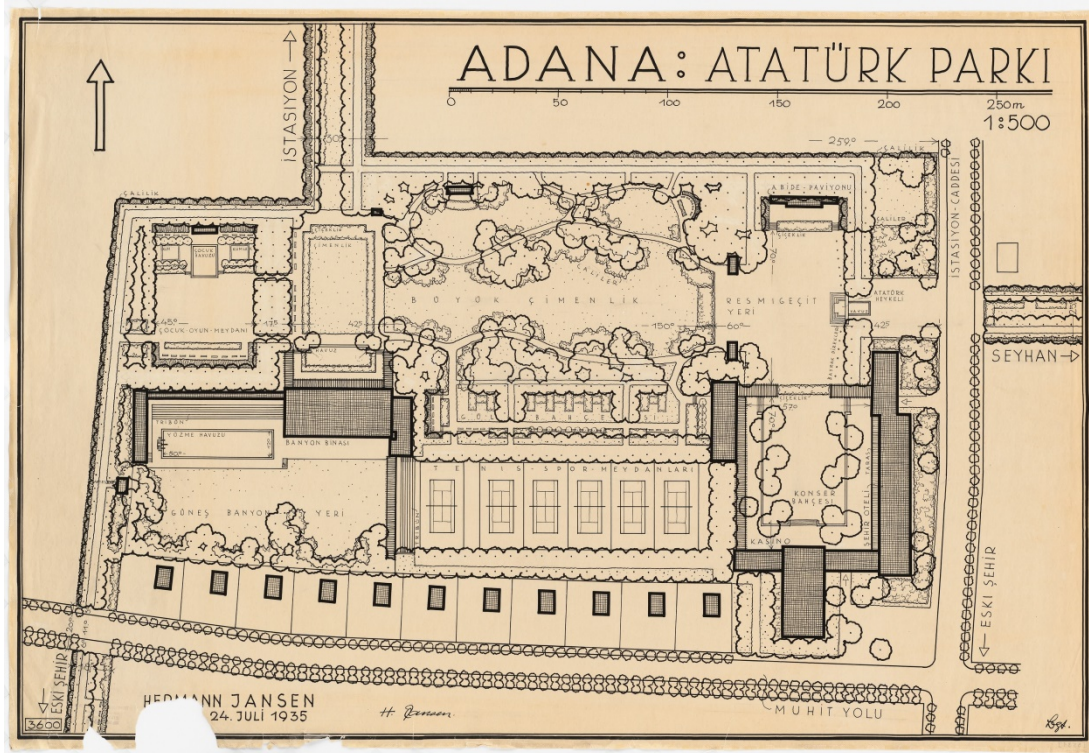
Site Plan of Atatürk Park (Jansen, 1935)
